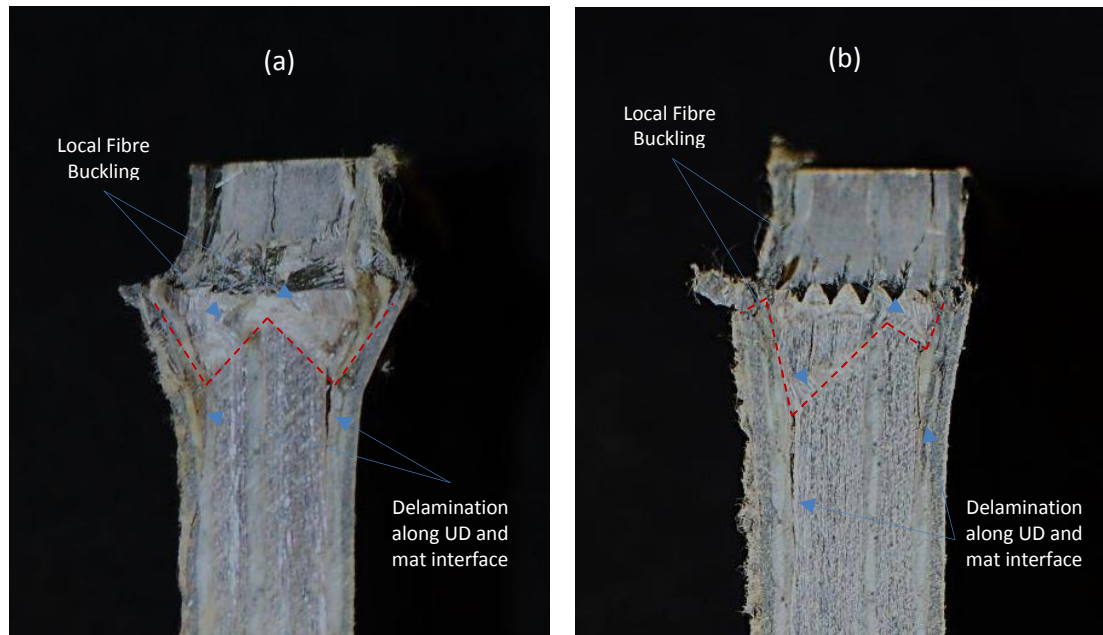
Bisected Pin-bearing Flange 0° Specimens for an M12 (a) Plain Pin and (b) Threaded Pin
